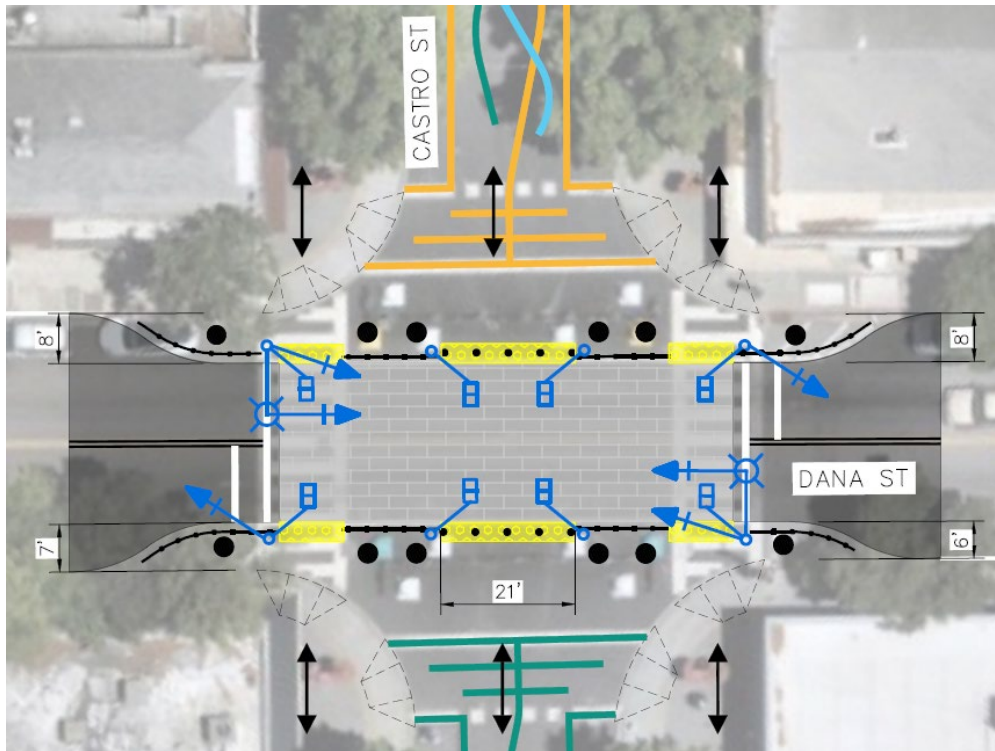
Dana Street/Castro Street Intersection Concept Layout
